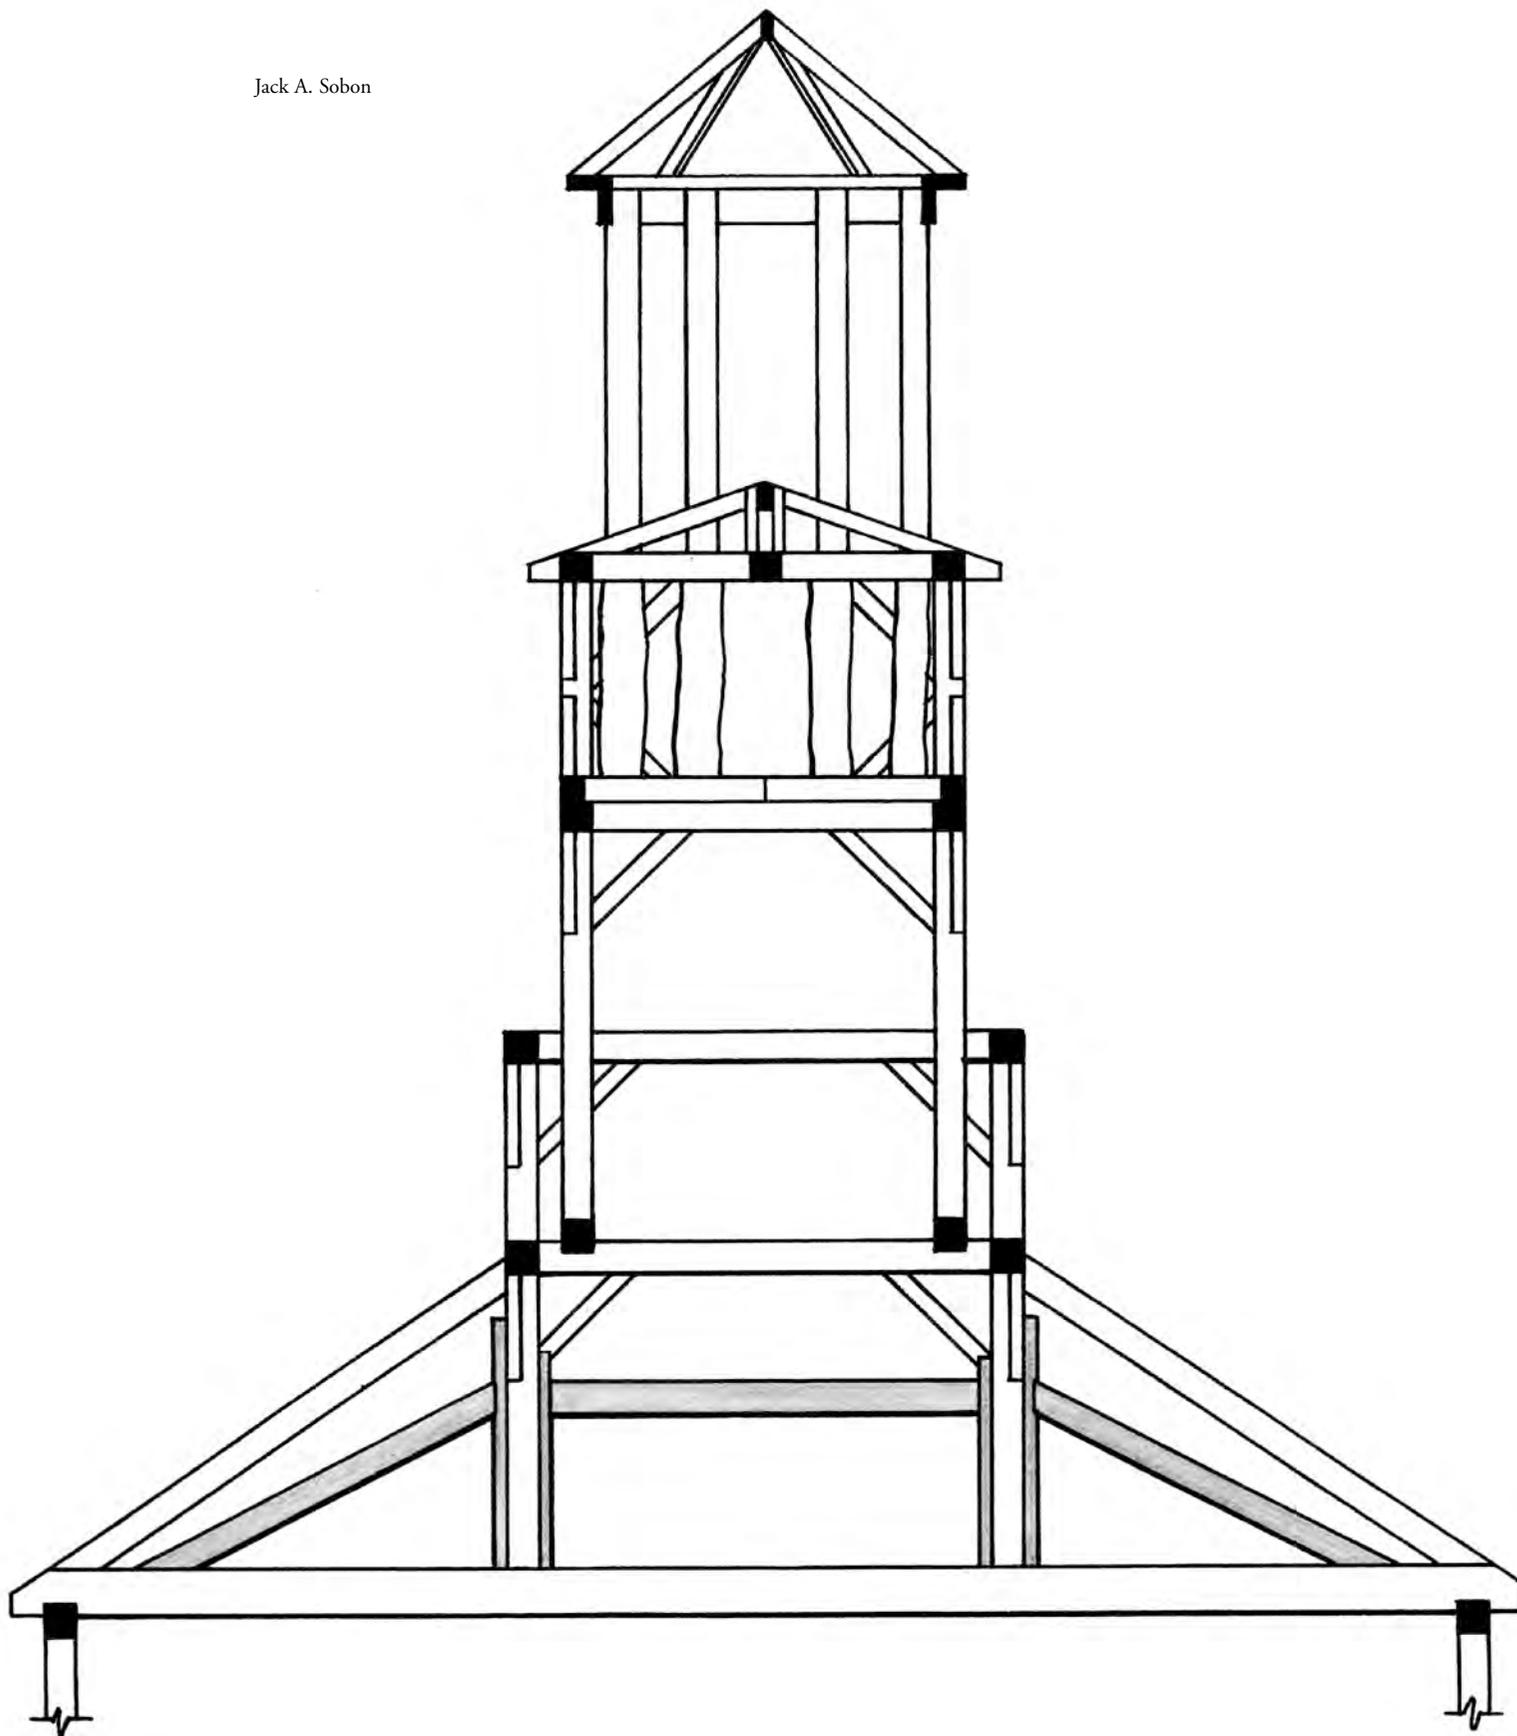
South Woodstock steeple frame section seen from inside looking toward back of church, showing queenpost truss formed by rear tower posts and truncated principal roof rafters. Shading indicates stiffening elements added during repairs. Posts rising to hipped bell deck are continuous.
